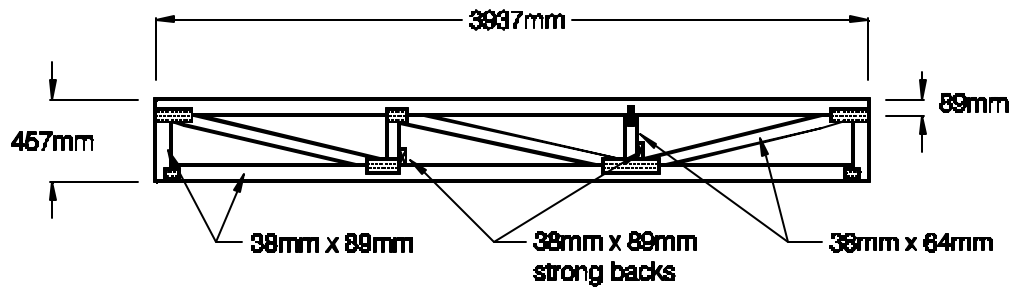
Construction of 457 mm deep wood trusses using 38 x 89 mm lumber.
